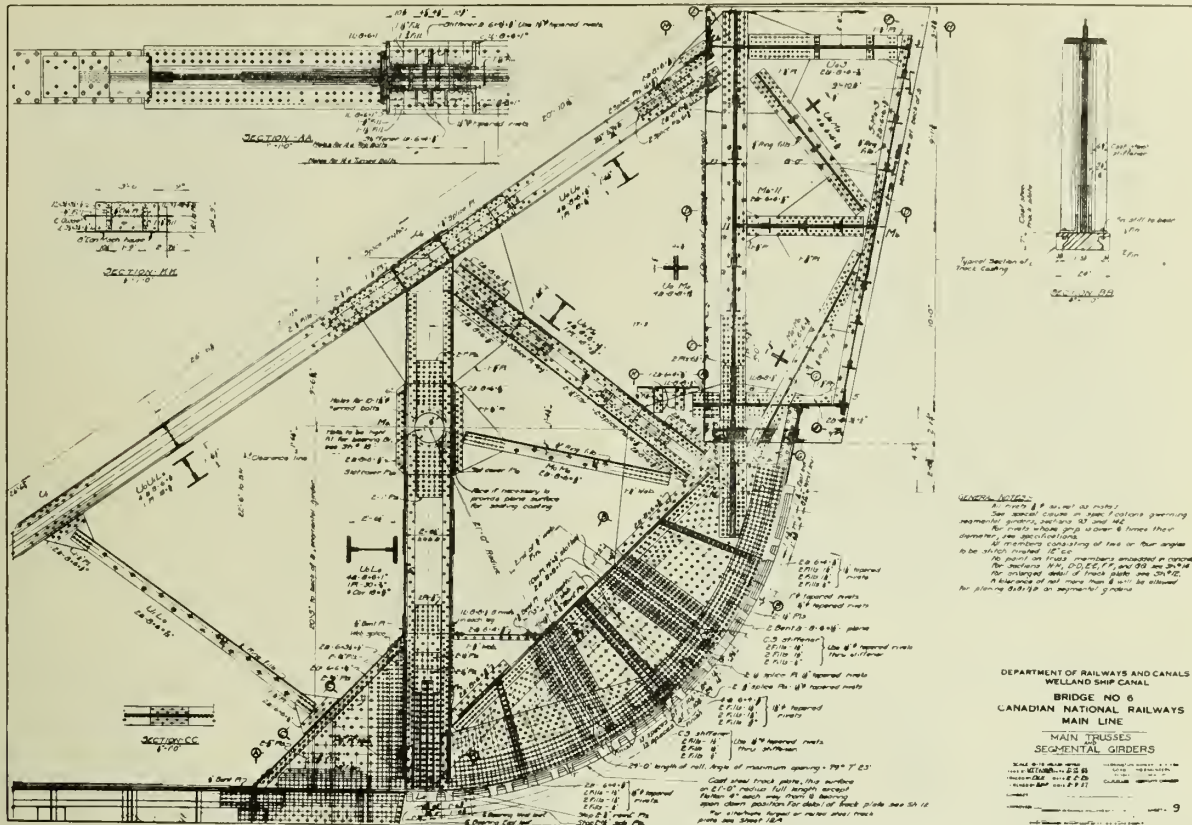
Bridge No. 6—Main Trusses and Segmental Girders.
